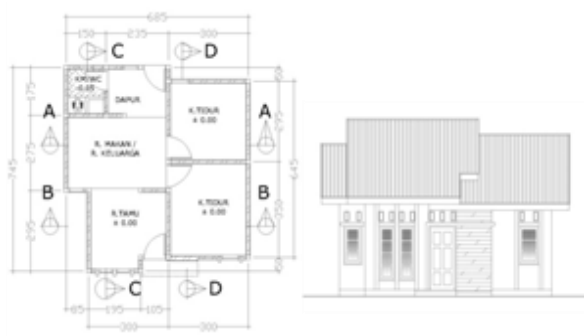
Plan and front façade of a T-45 house (source: PT Lopo Indah Permai)
